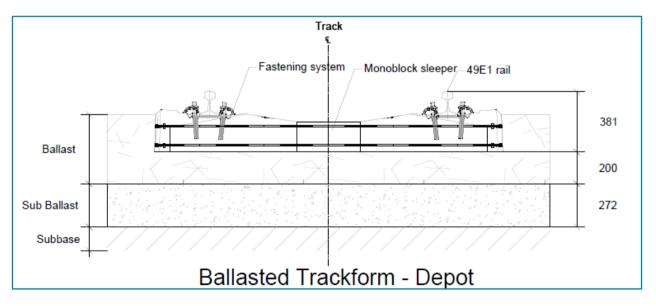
Depot Ballasted Track (Source Barry-Egis JV)
